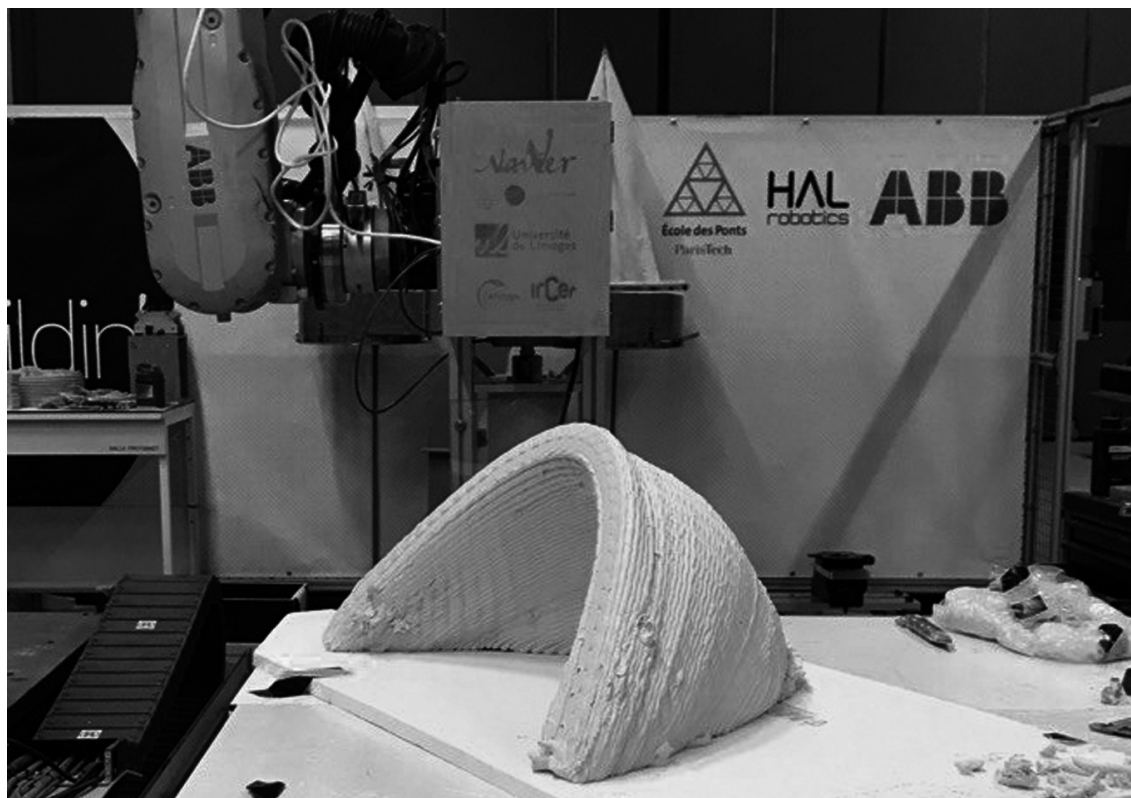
The First Medium Prototype: A Double-Layered Squinch - Detailed View of Construction and Layering Technique
